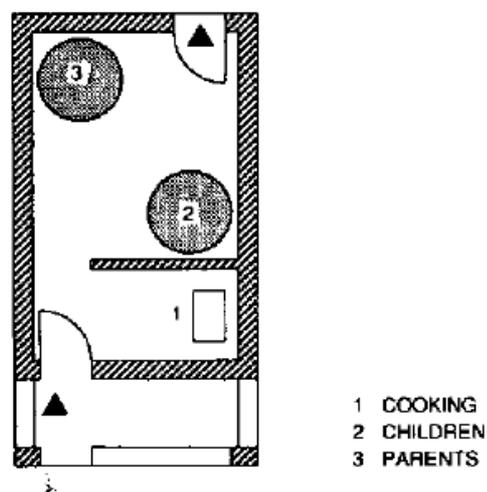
Floor plan of the house of the A. family. The plan shows how a diagonal alignment of doors creates two active spaces. Courtesy of Davis, Week, and Moses.
